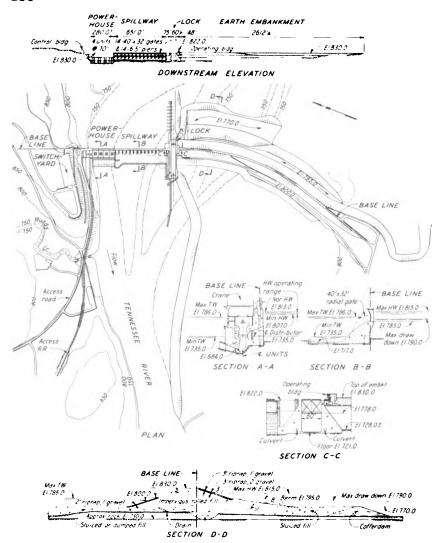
Fort Loudoun—plan, elevation, and sections.
